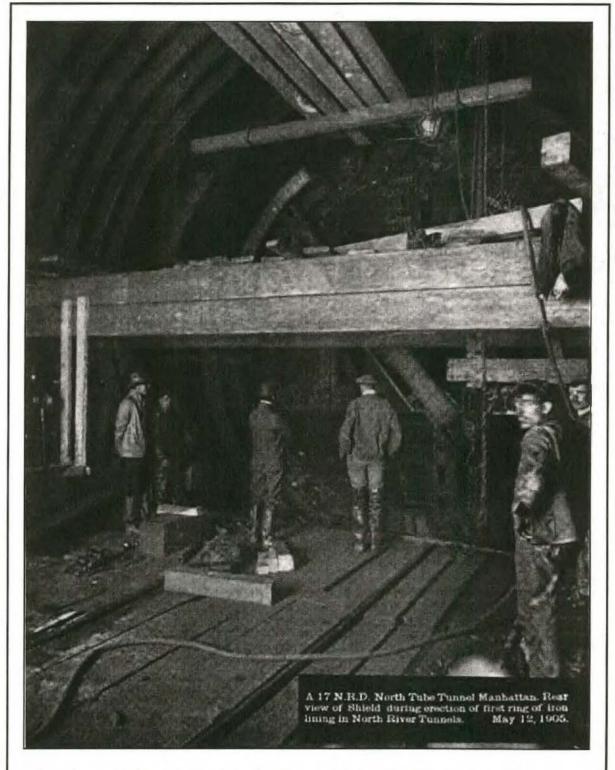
North River Tunnels Construction of Shields (1905) (New York Tunnel Extension: Description of the Work and Facilities Vol. I, No.1155, Plate XXXVIII, Fig 2.)
